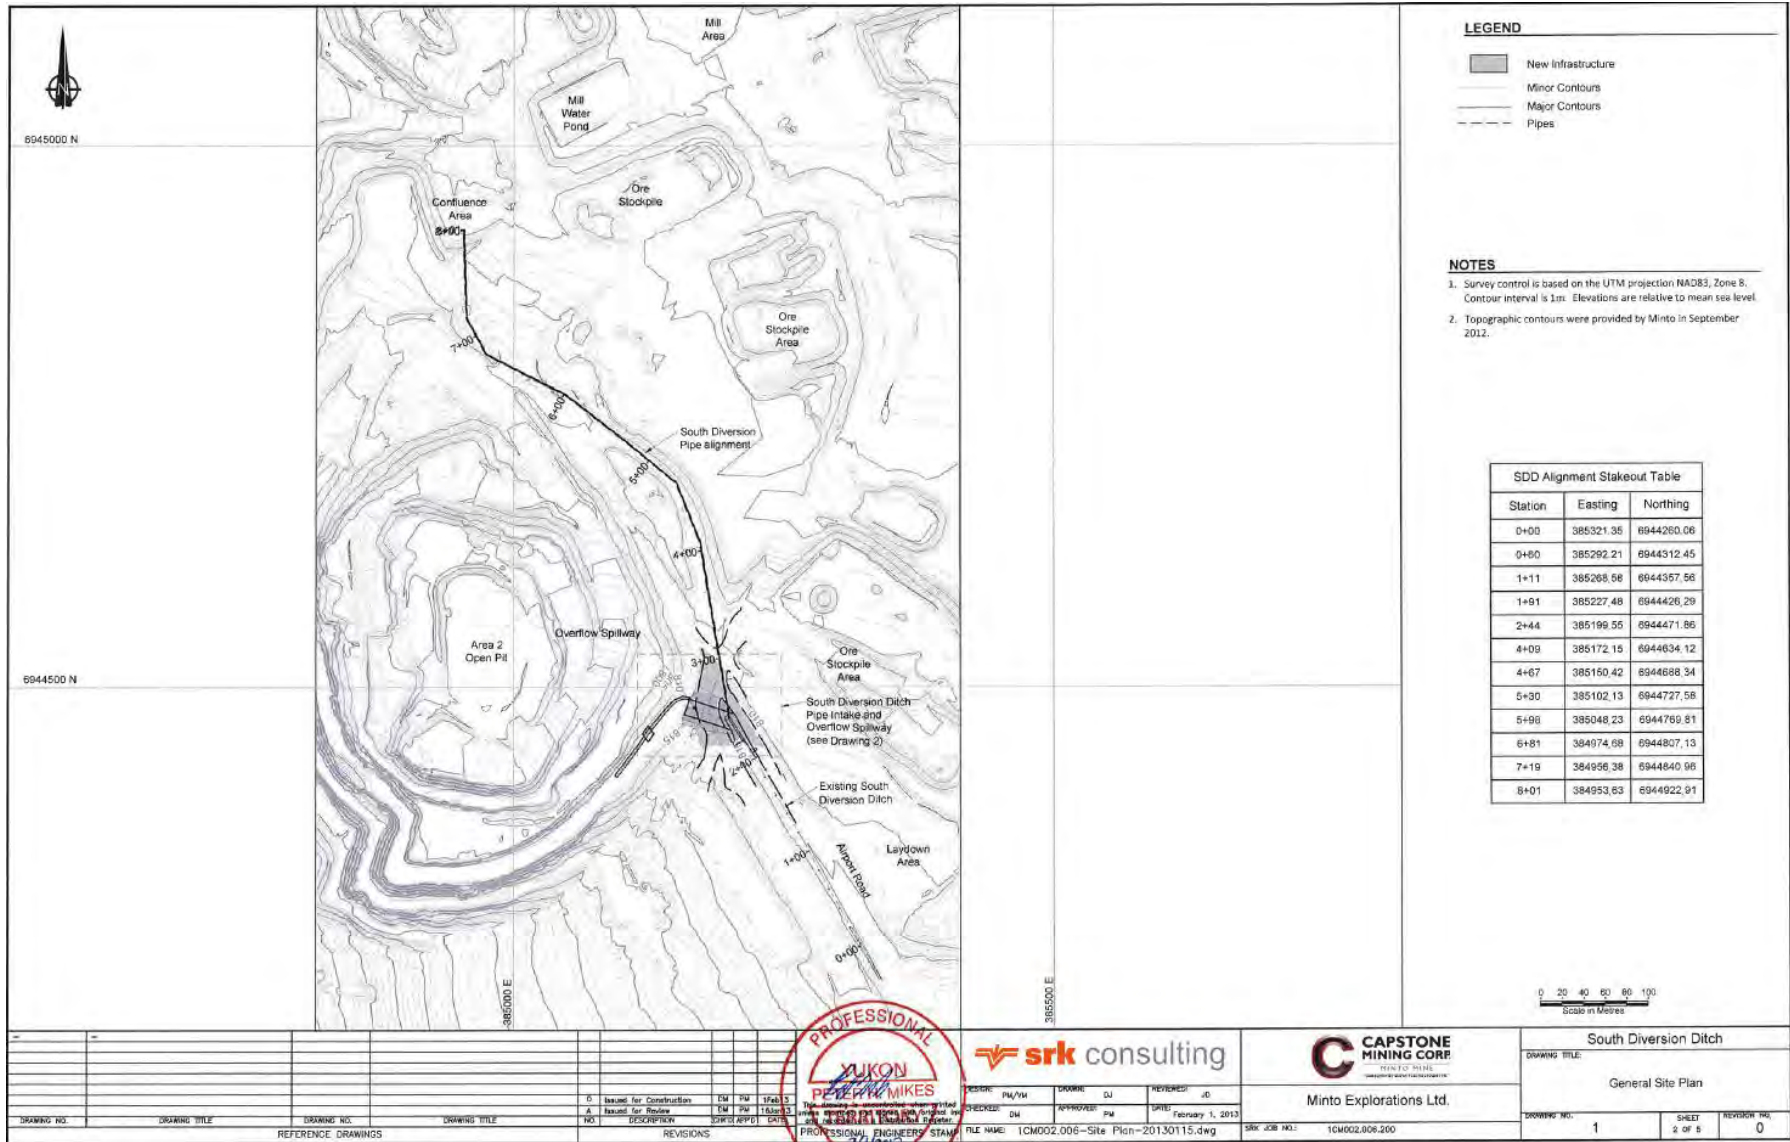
As-built topographic view of SDD pipeline and spillway location.
